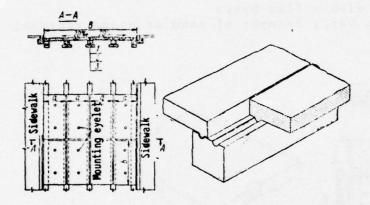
Reinforced concrete slabs on longitudinal foundations: 1-Reinforced concrete slab; 2-Reinforced concrete foundation; 3-base under the foundation with thickness h.
